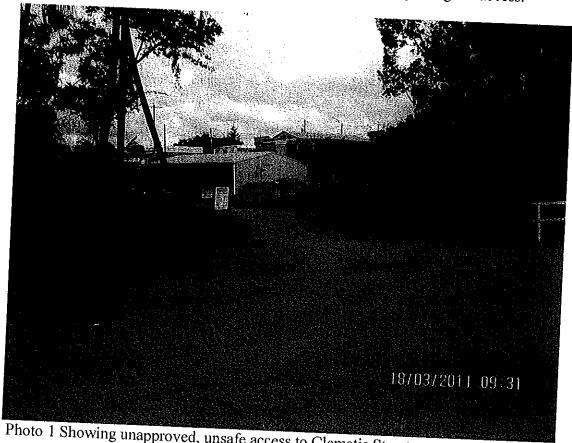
Showing unapproved, unsafe access to Clematis Street.
